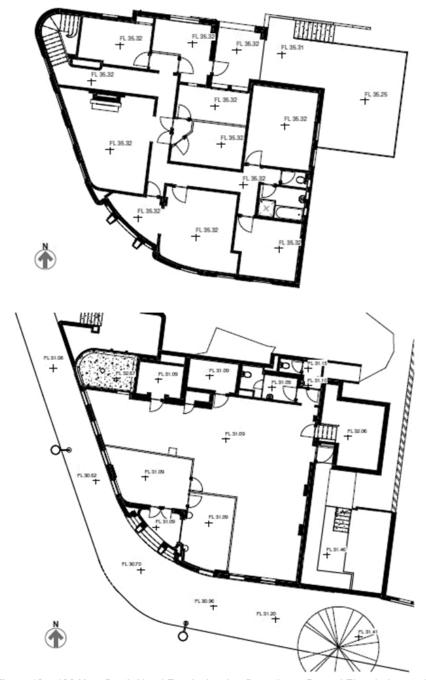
136 New South Head Road, showing floor plan – Ground Floor below and First Floor above Source: GBA, HIS 2020
